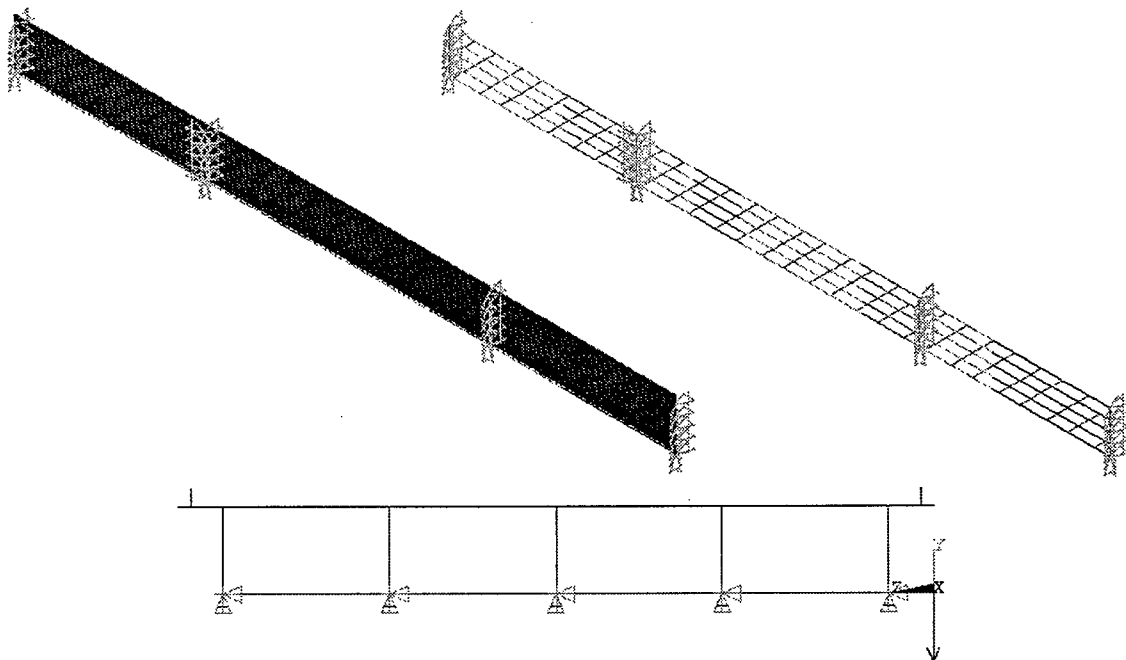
Model of Route 220 Bridge with Framing Plan and X-Sectional View
